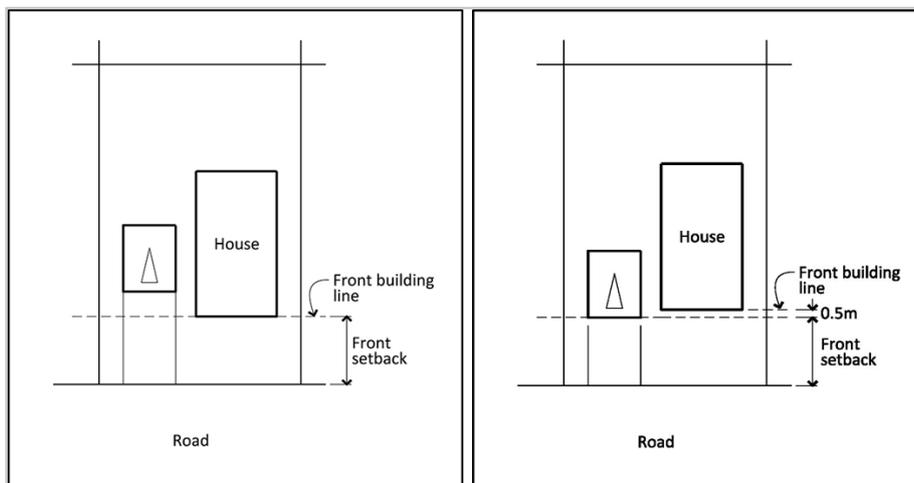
Setback for accessory buildings – example of a detached accessory building
